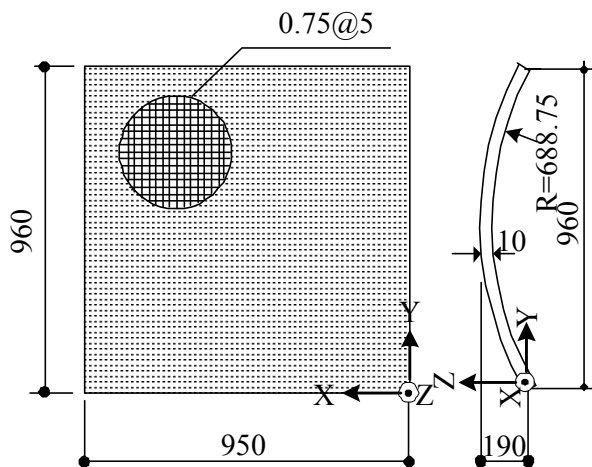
Geometric dimensions of R/C cylindrical shell (unit:mm)
